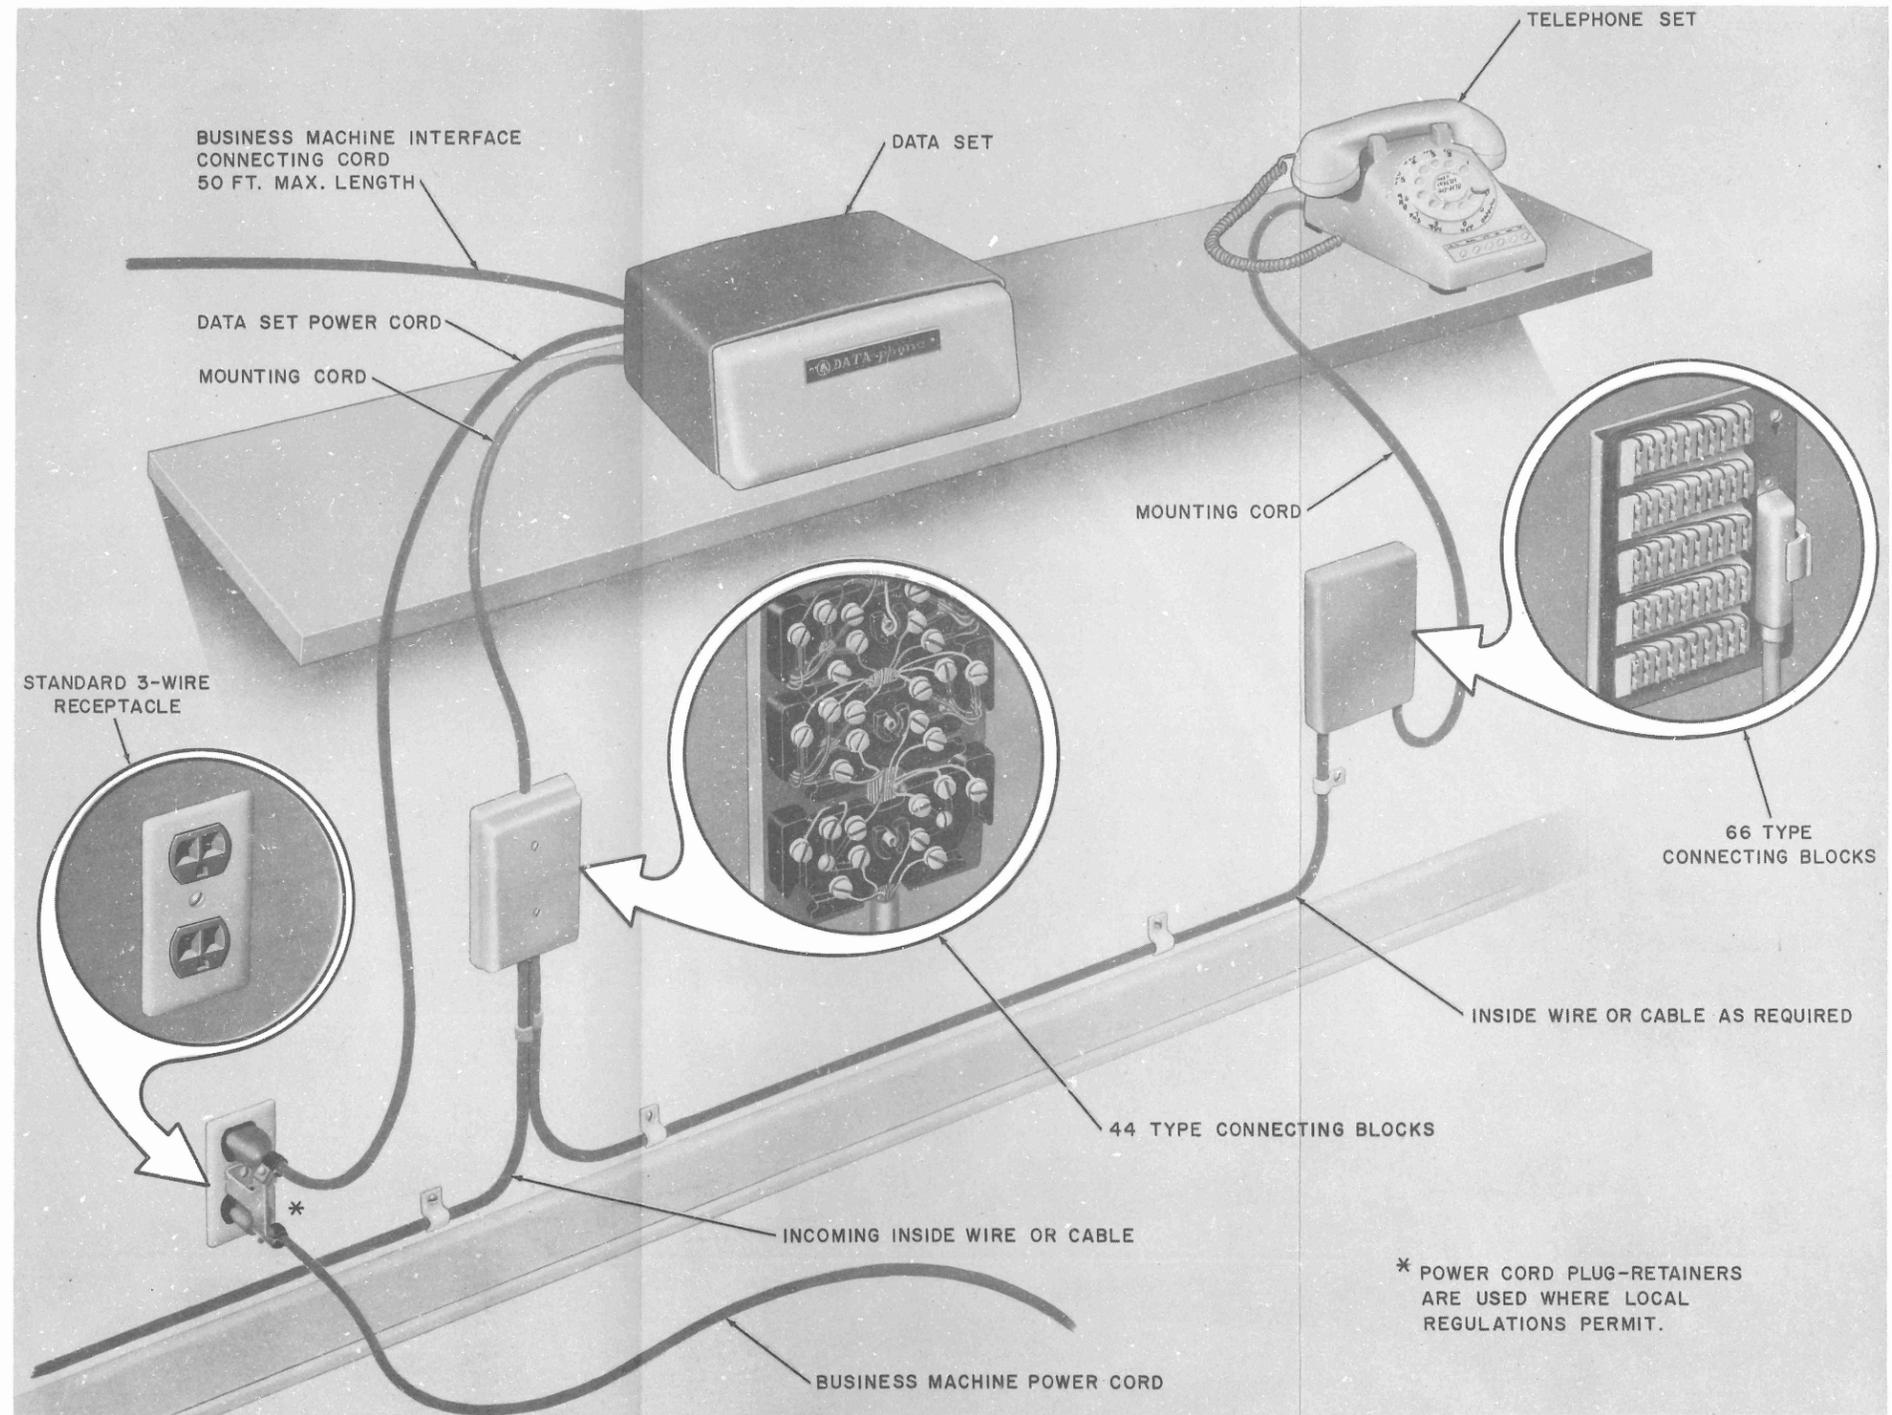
Main Components of a Typical Installation Layout — Data Set 202B and Telephone Set Connected to Two-Wire Switched Network — No Provision for use with Key Telephone System
